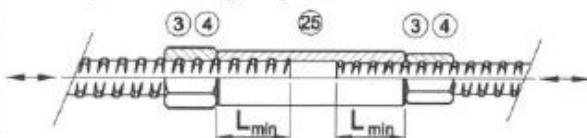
Coupler, standard Ø12 - 50; thread coupler Ø12 - 32
